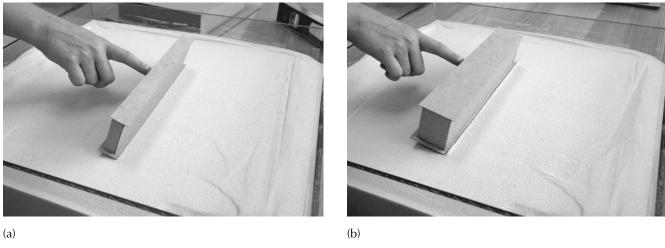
Buildings with tall, narrow proportions tending to turn over under lateral forces.
